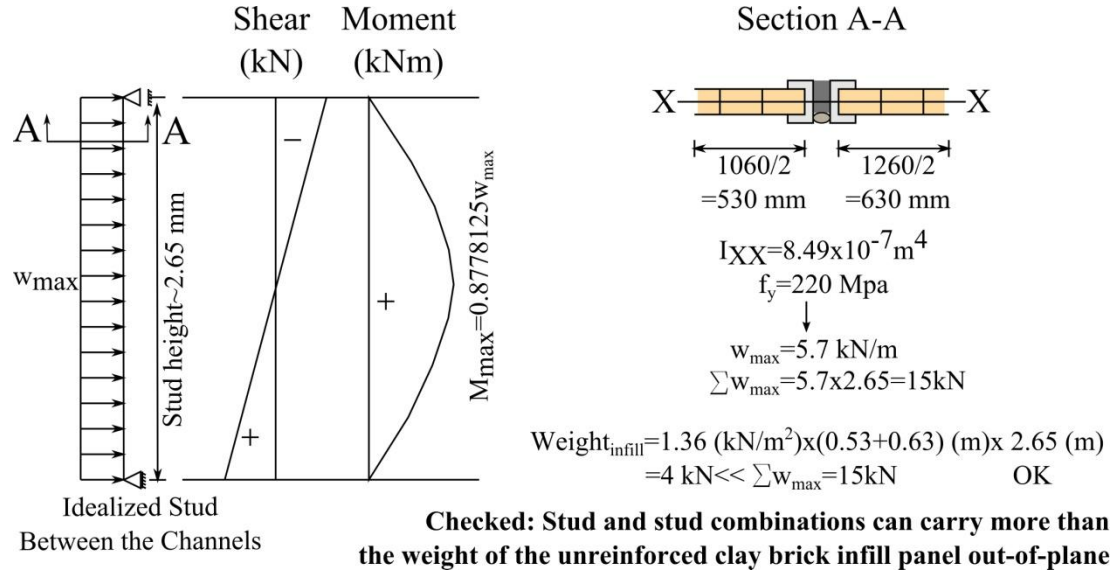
Developed low damage solution for unreinforced clay brick infill wall specimen MIF5-UCBI with four 10 mm width isolation gaps between the individual infill panels
